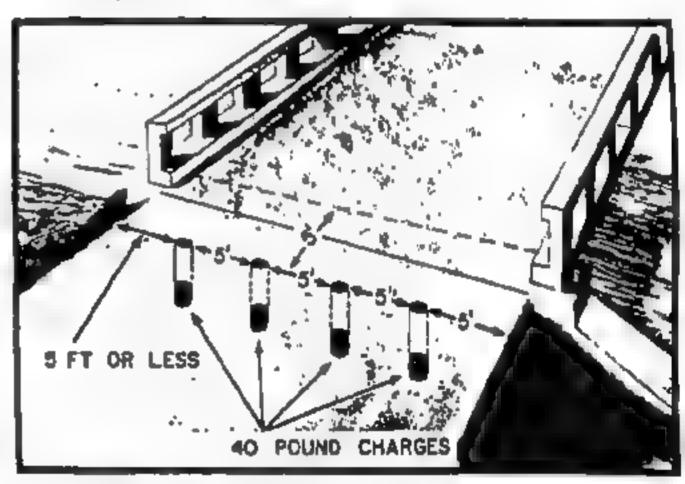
Charges placed in 20) behind reinforced concrete abutment 5 feet or less in thickness. (The 5-5-5-49 method)
